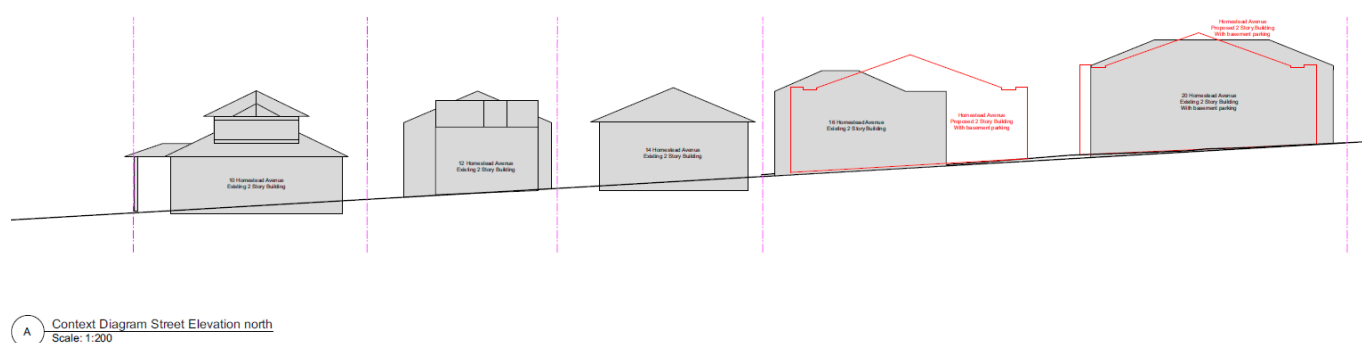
Homestead Avenue Streetscape – showing the existing and proposed building envelopes
